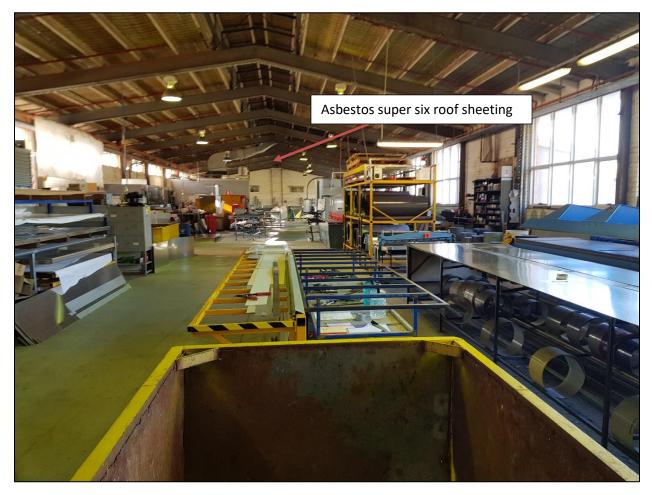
Sheetmetal and Plumbing Workshop at 45-47 Thistle Street West
